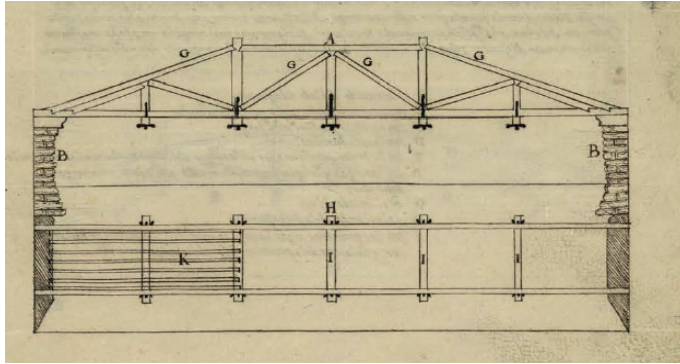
A lattice truss bridge (I). Bridge on the Cison.
